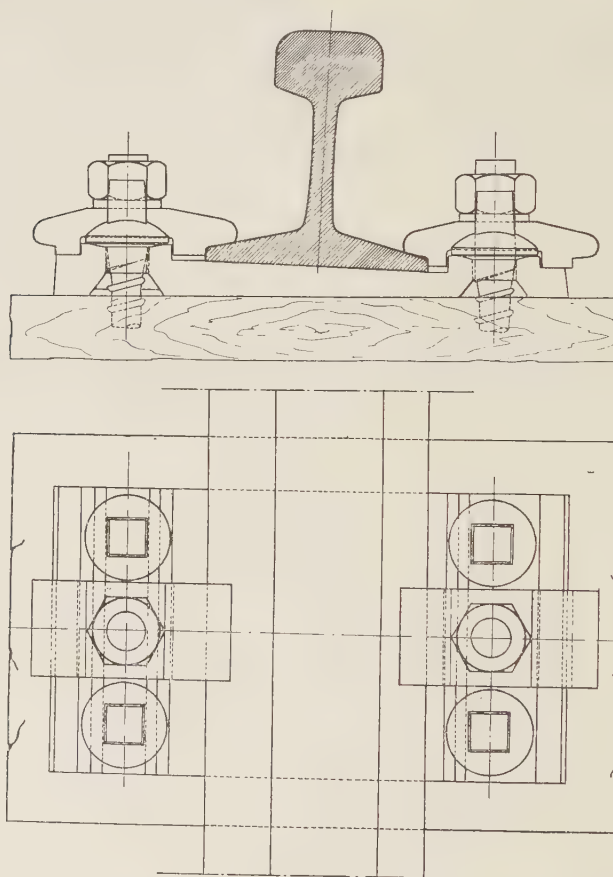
Use of metal bearing plate with indirect fastening to the sleeper — Italy, F.S.P. type.
